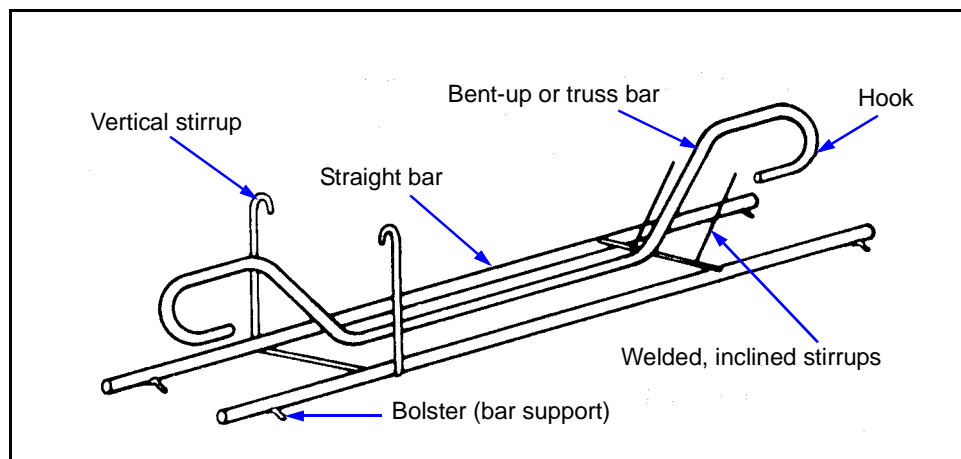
Typical Shapes of Reinforcing Steel for Beams
